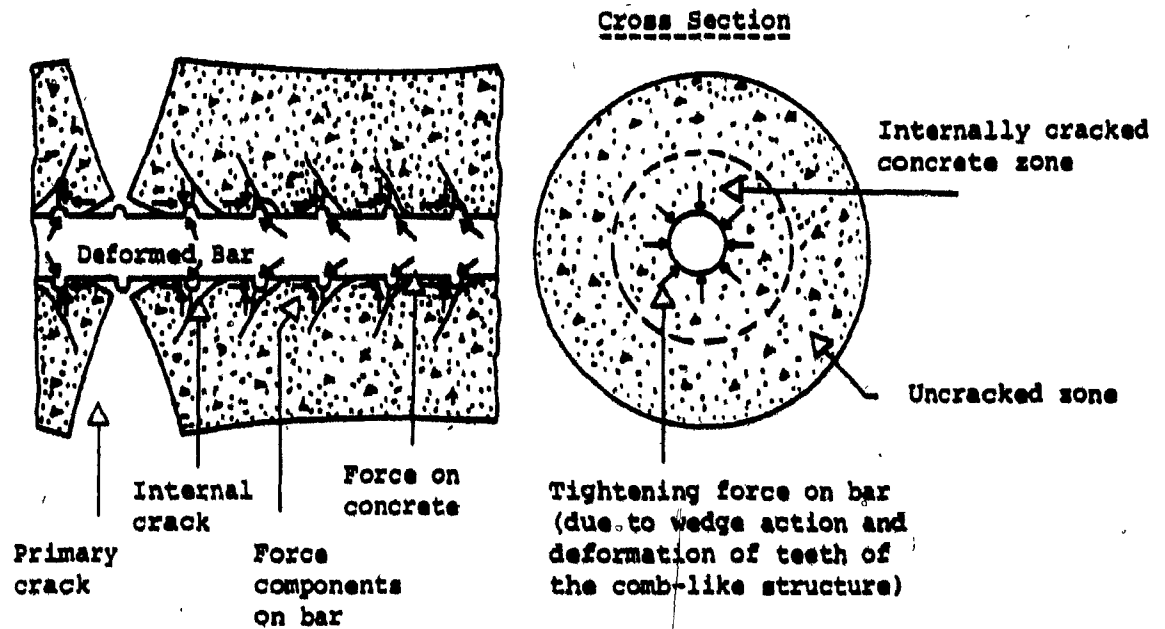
Deformation of Concrete Around Reinforcing Steel Bar after Formation of Internal Cracks (13)
